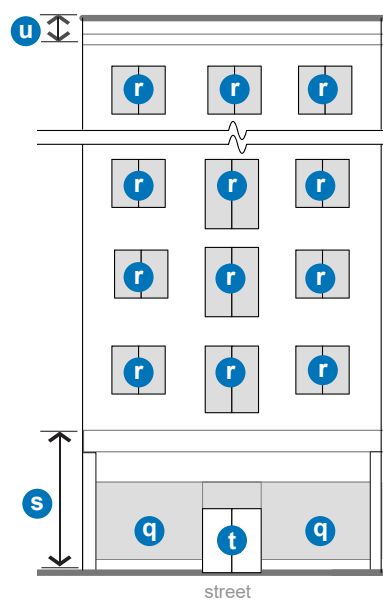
(3) Storefront Building: Street Facade Requirements
